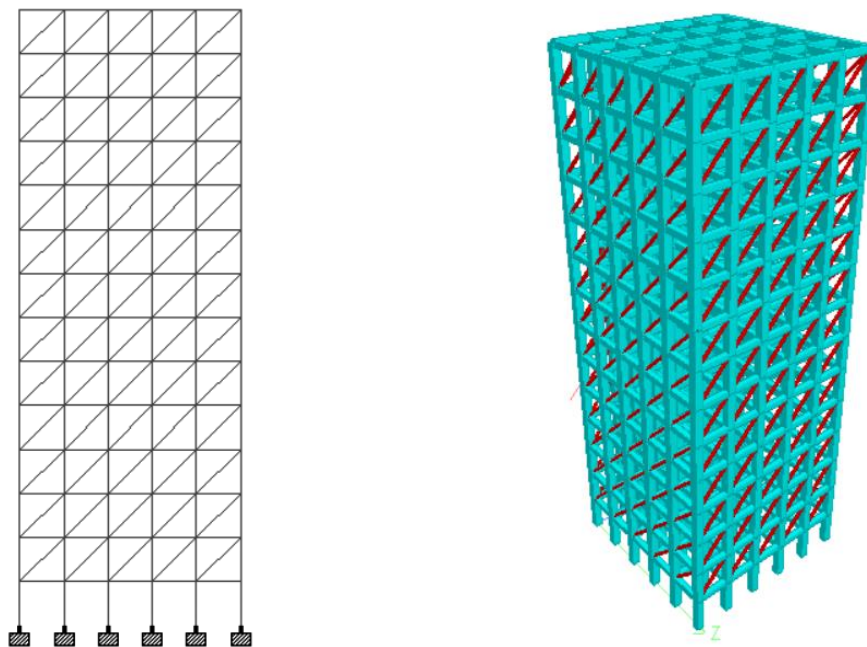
Elevation and 3D View of RC Frame Structure with X Bracing
